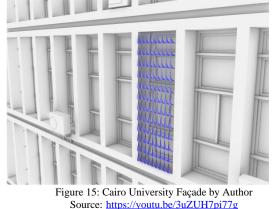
Cairo University Façade by Author Source: <u>https://youtu.be/3uZUH7pi77g</u>
